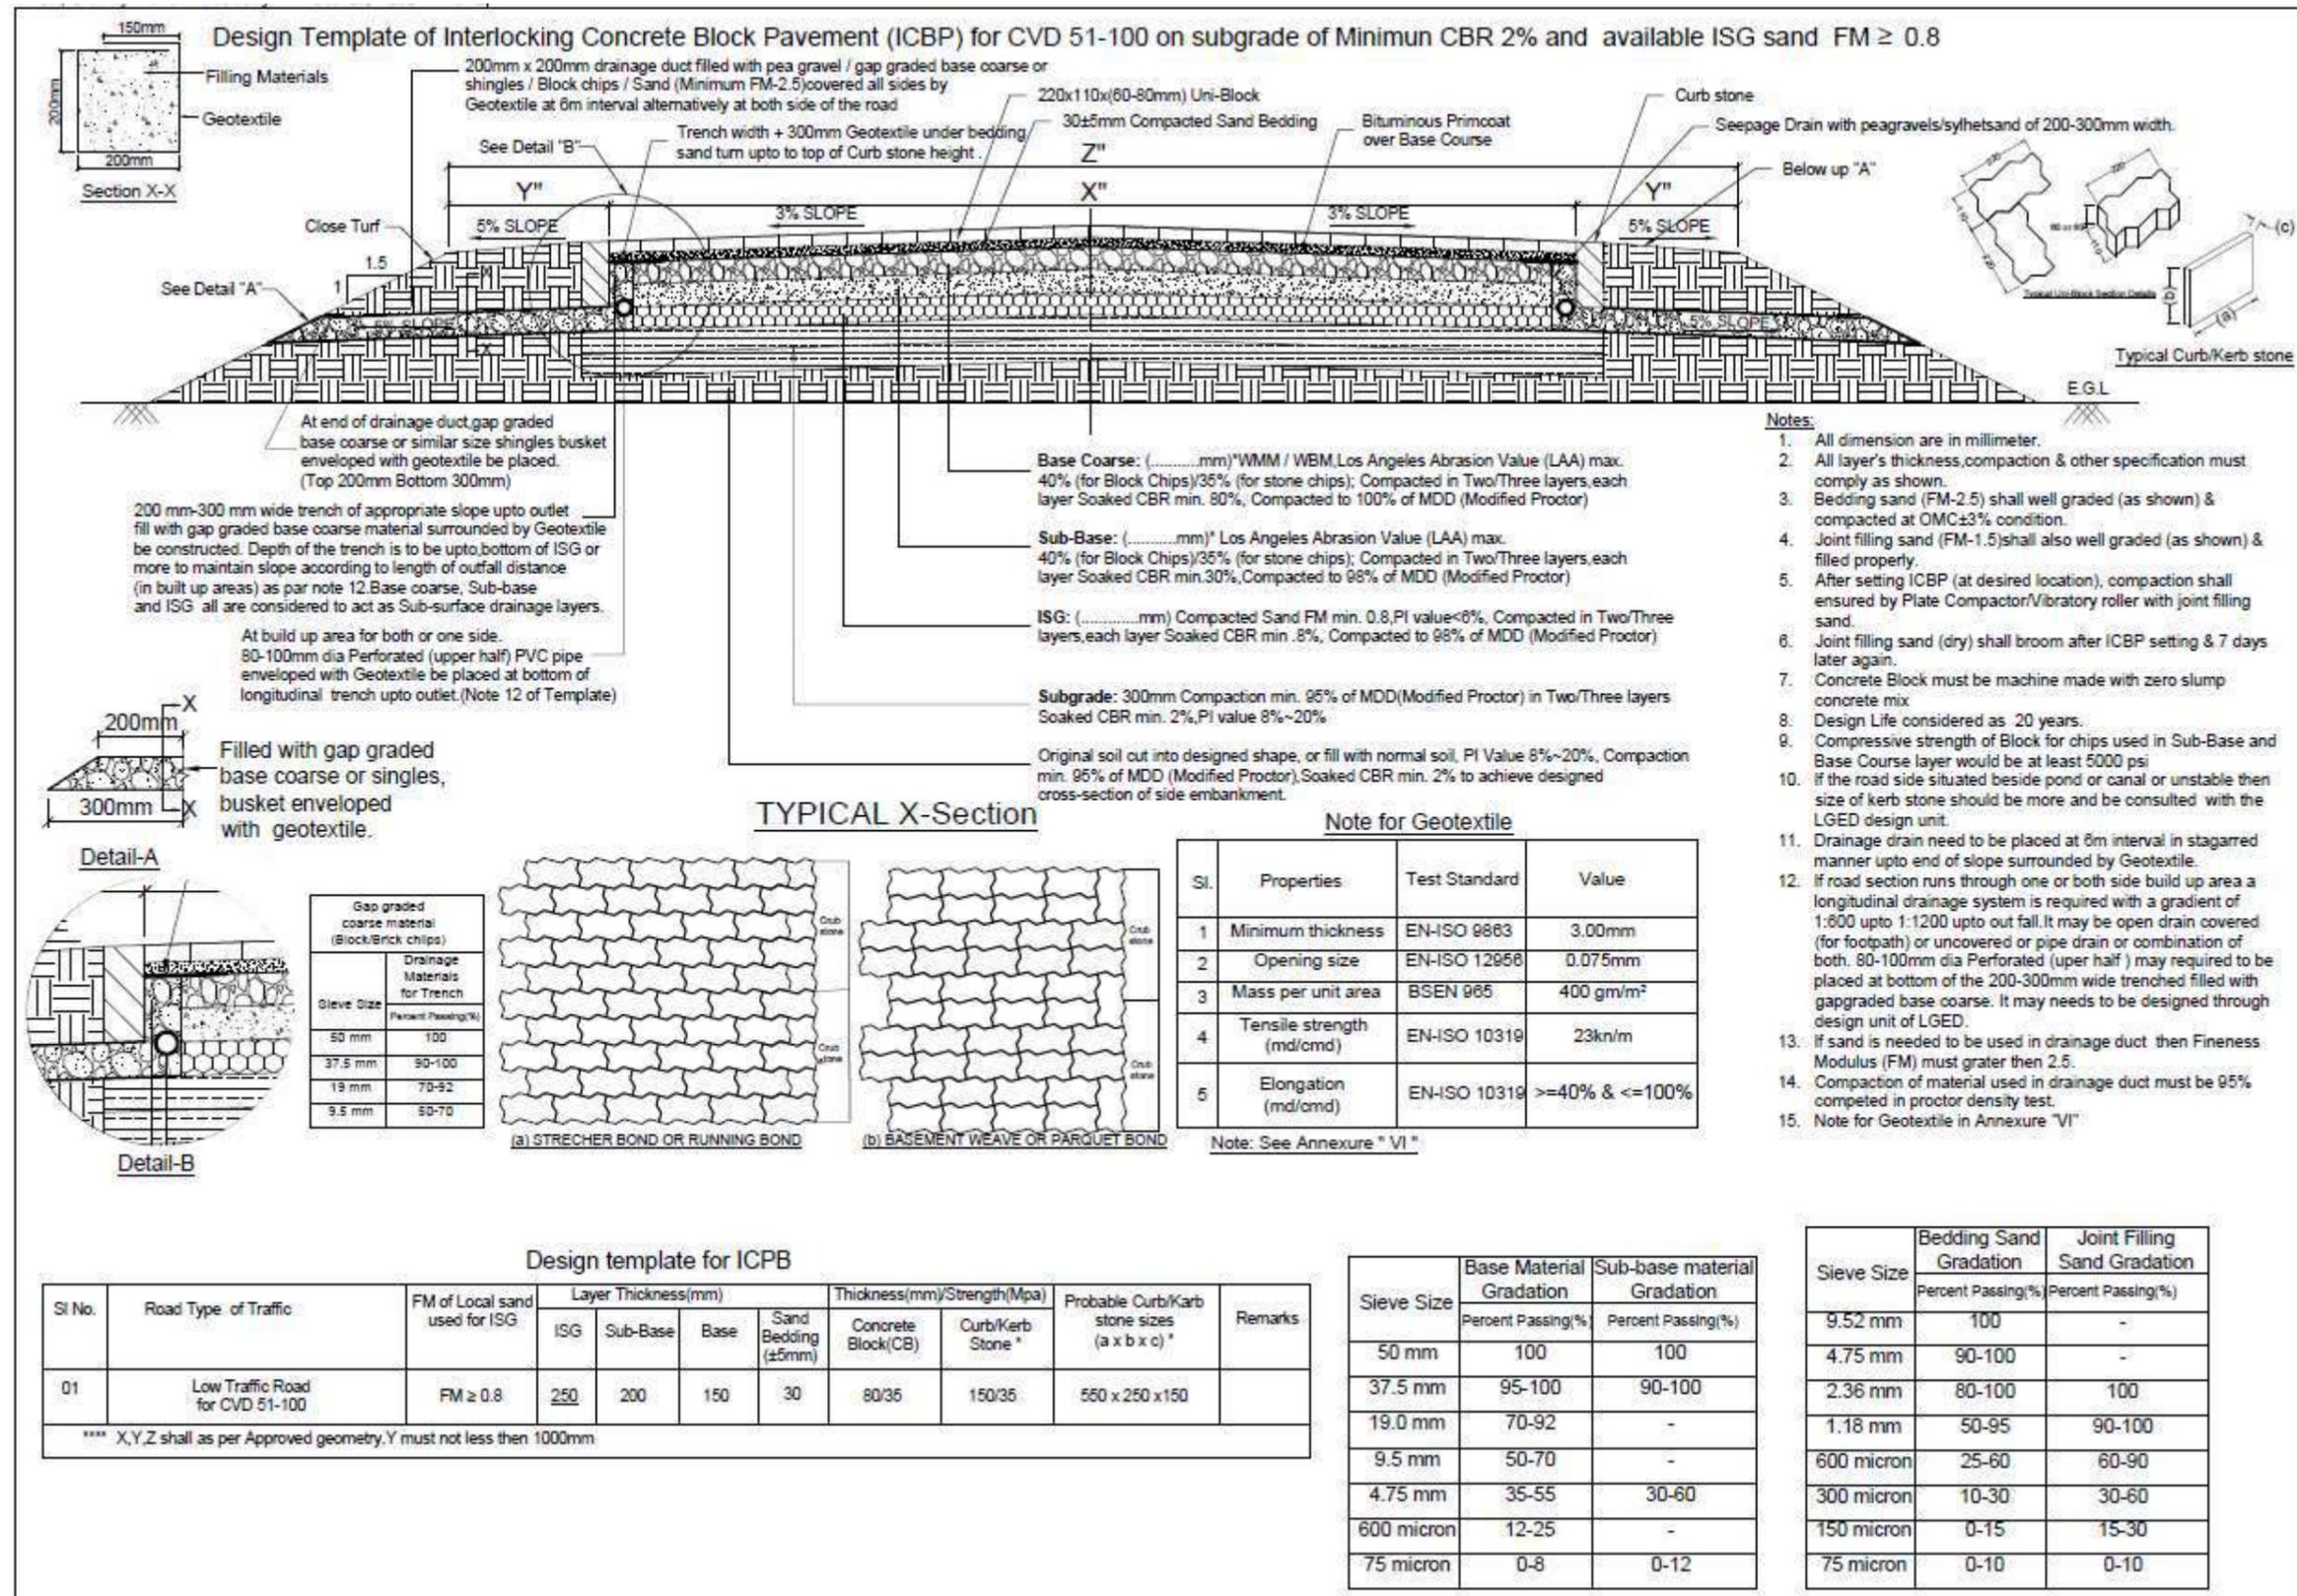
Design Template of Interlocking Concrete Block Pavement (ICBP) for CVD 51-100 on subgrade of minimum CBR 2% and available ISG sand FM ≥ 0.8
